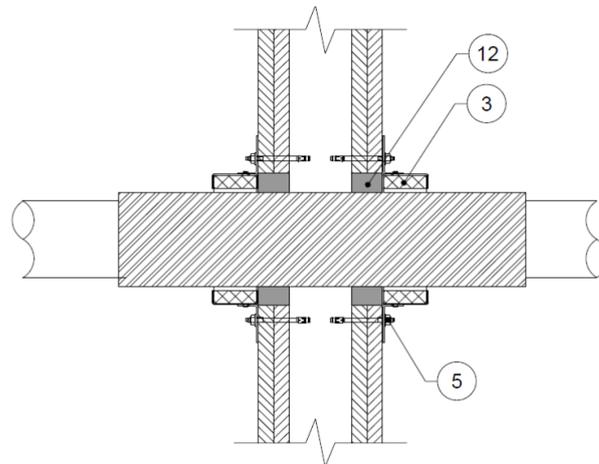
Sealant detail around Insulated pipes in plaster board walls and Dintel walls
